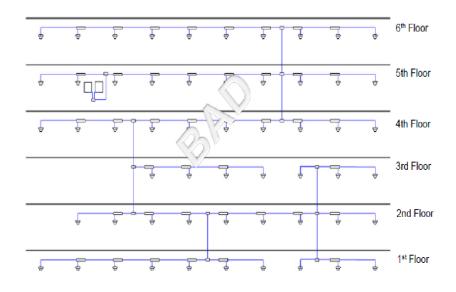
Poor vertical design complicates testing with branches covering multiple floors
